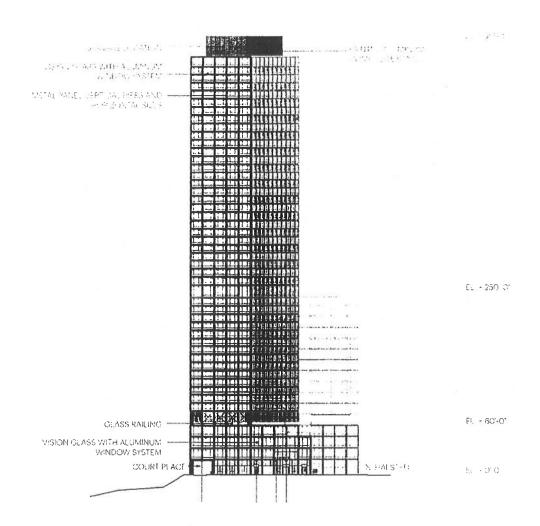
A: NORTH TOWER ELEVATION WITH RANDOLPH STREETSCAPE
